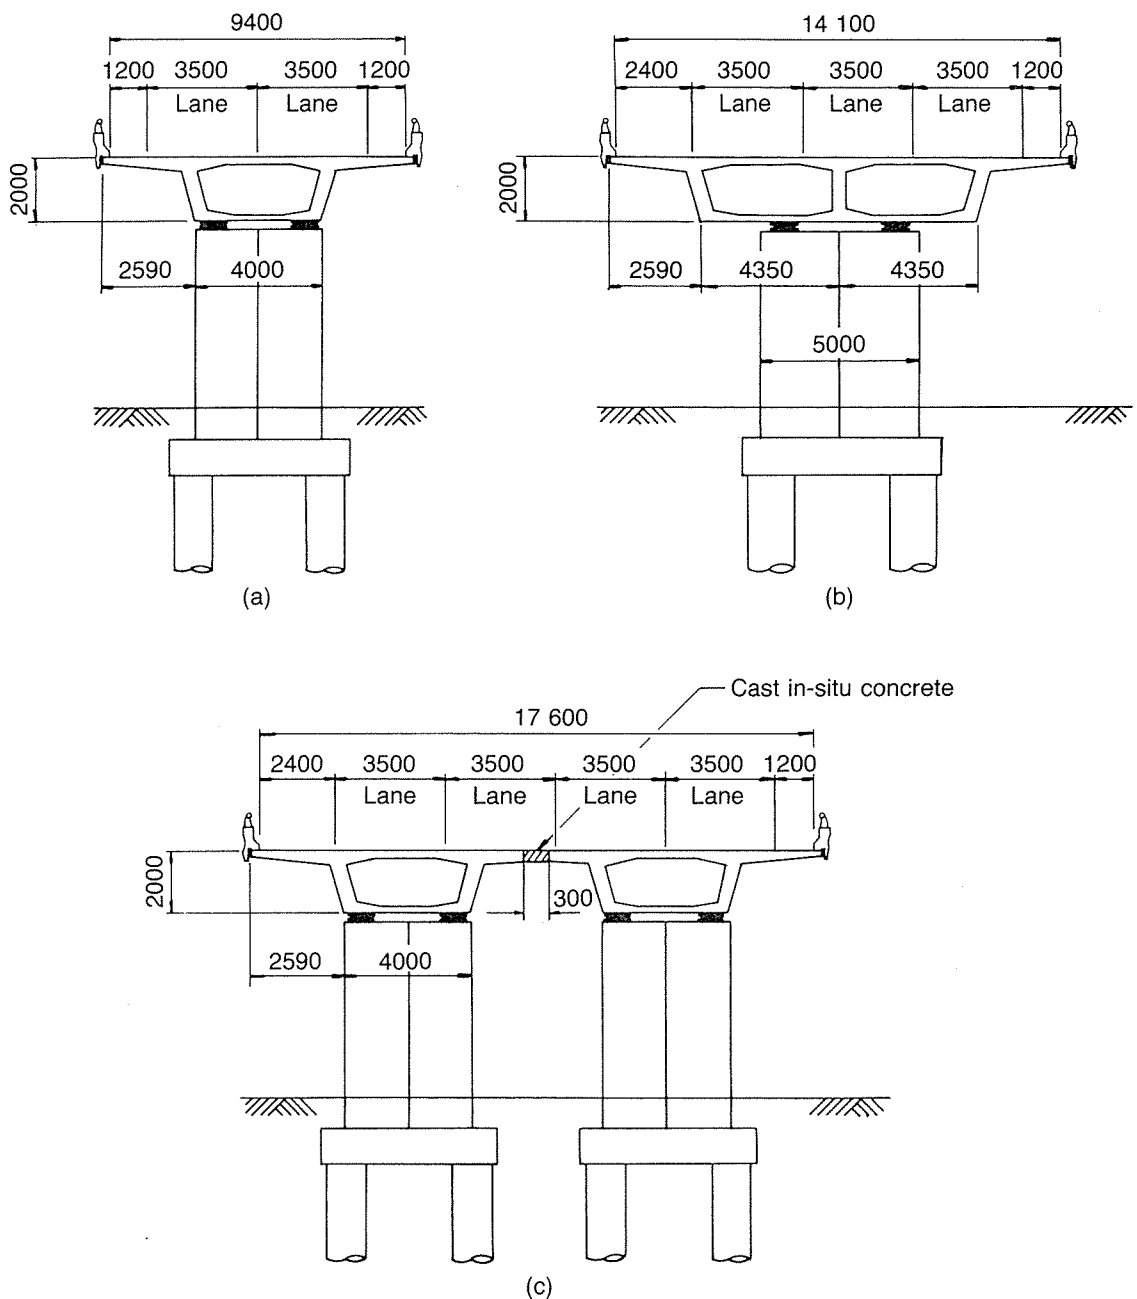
Typical cross-sections showing substructure and superstructures: (a) single cell segment ramp (two lanes); (b) twin cell segment carriageway (three lanes); (c) dual single cell segment carriageway (four lanes)
